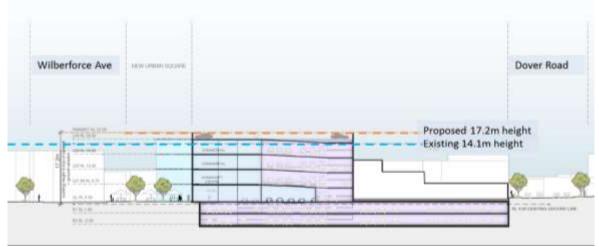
Section between Wilberforce Avenue and Dover Road showing the existing and proposed maximum building heights, concept for the site and surrounding existing buildings
